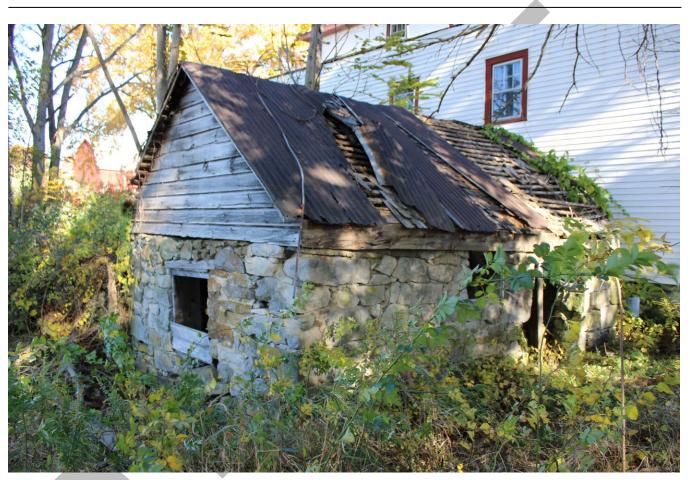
View of the west and south elevations of the spring house with the west elevation of the farmhouse beyond, camera facing east.
